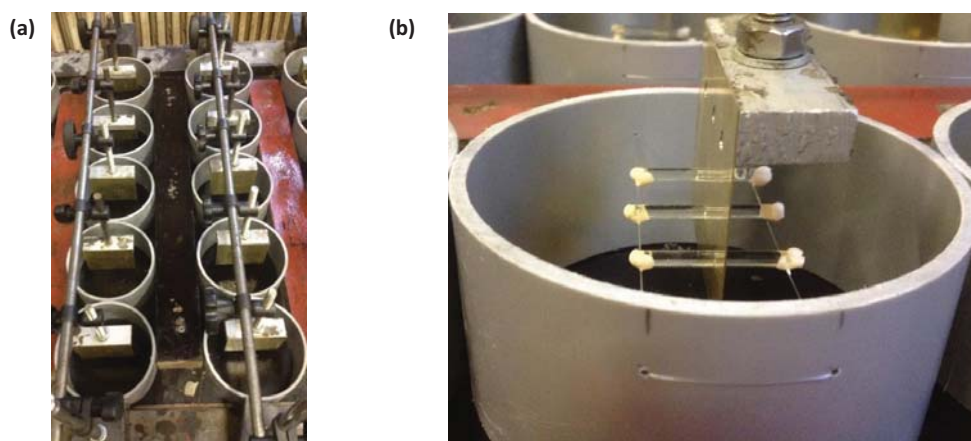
(a) Positioning of the steel plates to create artificial cracks; (b) preparation of specimens with an autonomous crack healing mechanism.
